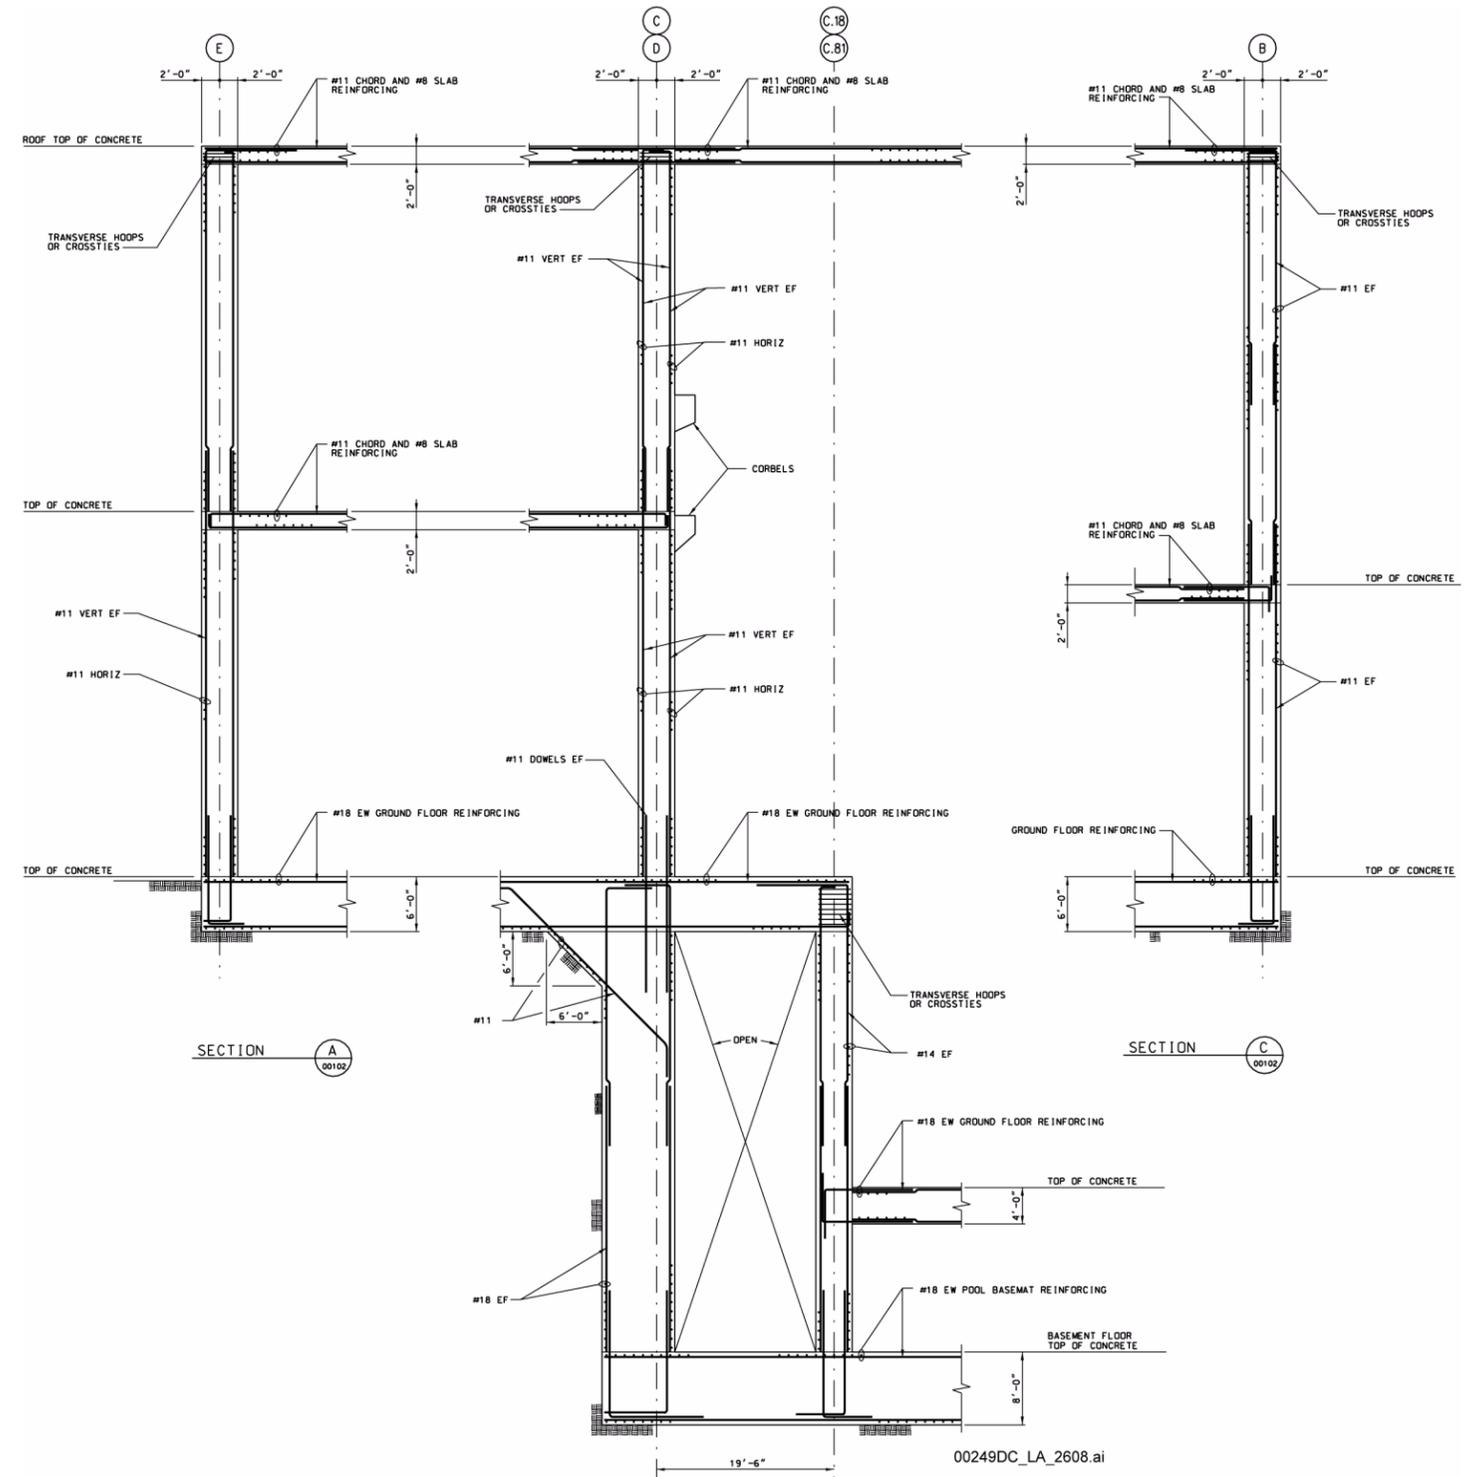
Typical Wet Handling Facility Reinforcing Sections
